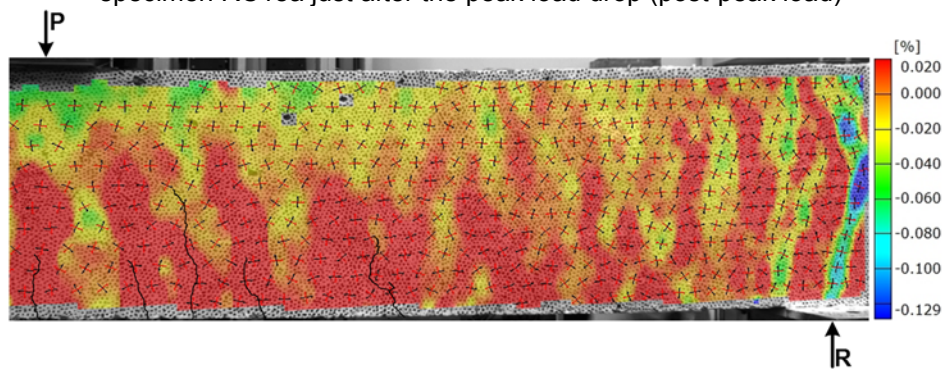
Scaled full-field concrete longitudinal strain ( $\epsilon_x$ ) across shear span for specimen RC18a at load 35 kips
